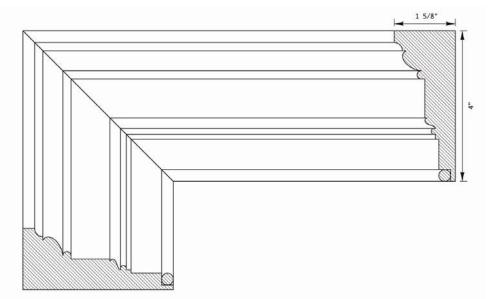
A-33. Door & window profile from the Hyde-Lincoln House, Charlestown, MA, 1801. (Drawing from Smith and Mudrick, *Federal Style Patterns: 1780-1820*, p. 83). Not to scale.
